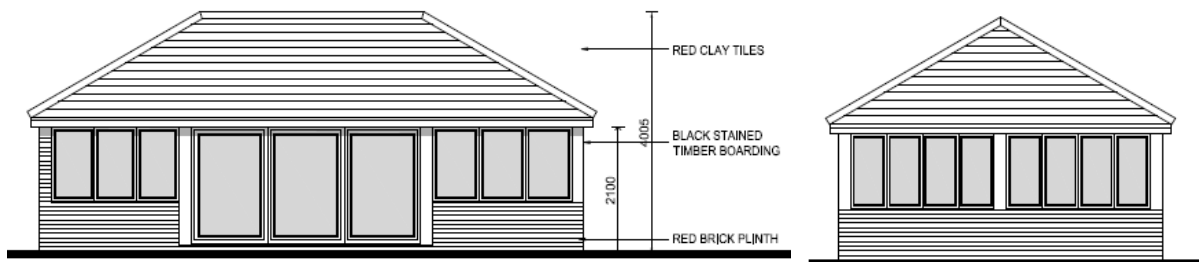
Side (South West) Elevation and End (North-West) Elevation – As Proposed
